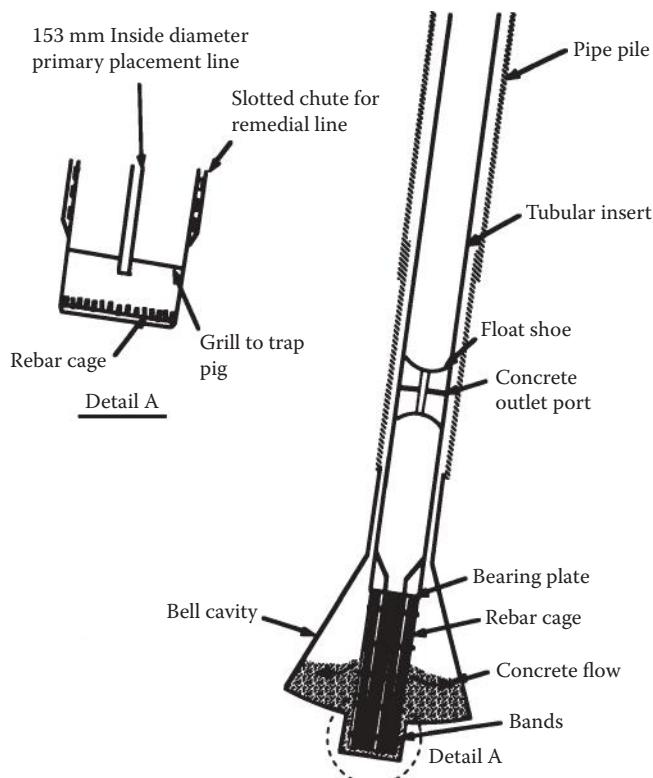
Belled footing provides greater bearing area for a driven-and-drilled steel tubular pile.
